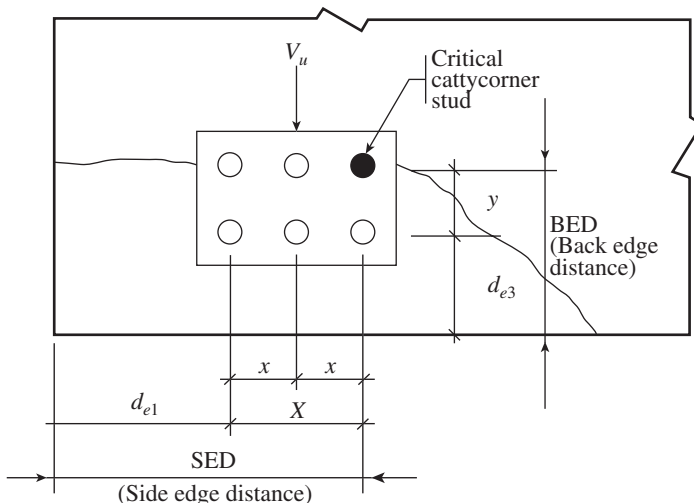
Corner concrete breakout when headed stud anchor is located near a member corner
